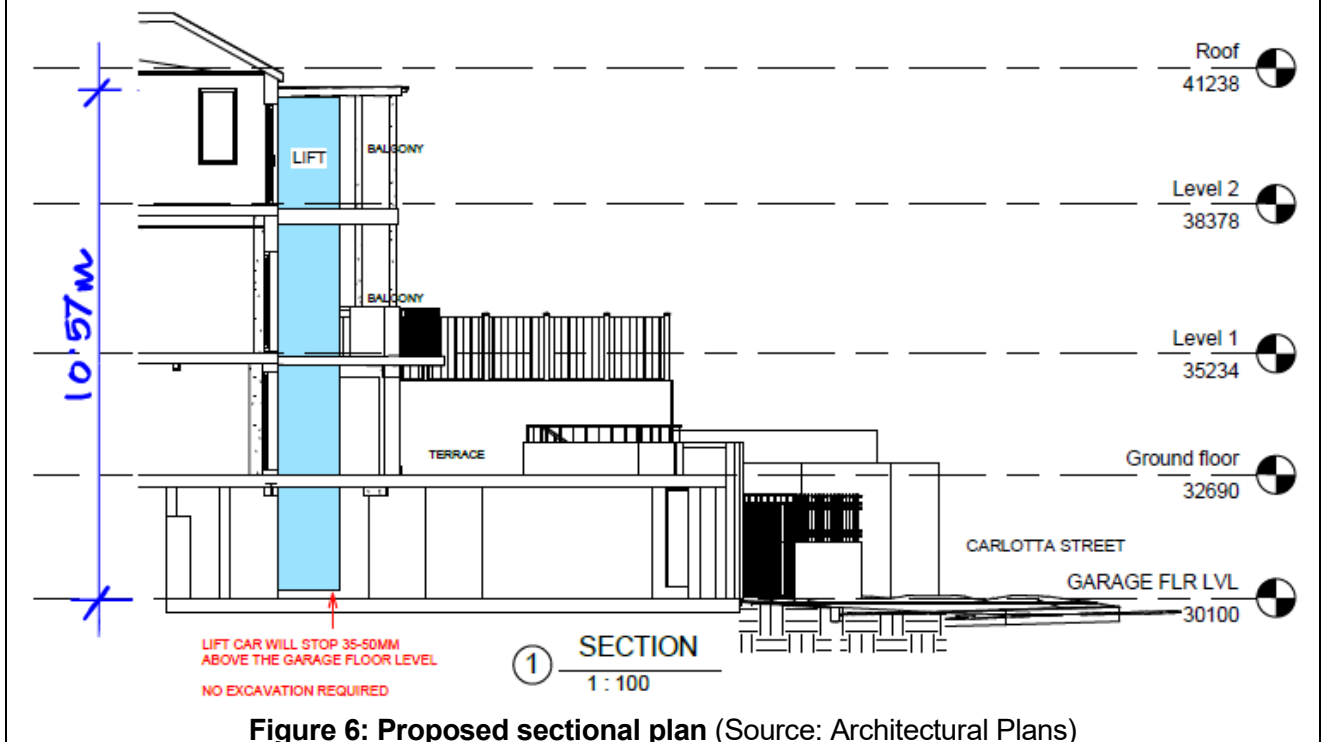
Proposed sectional plan (Source: Architectural Plans)
